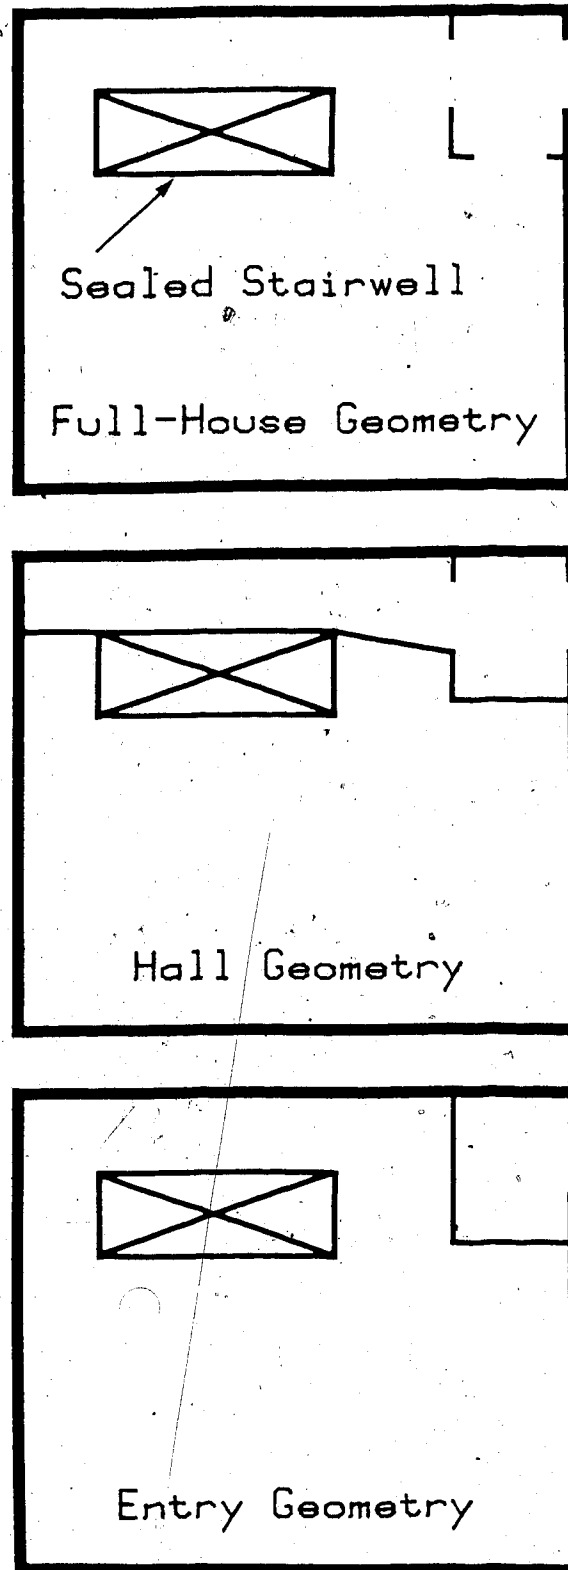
Interior Test Geometries; Full-House, Hall and Entry
